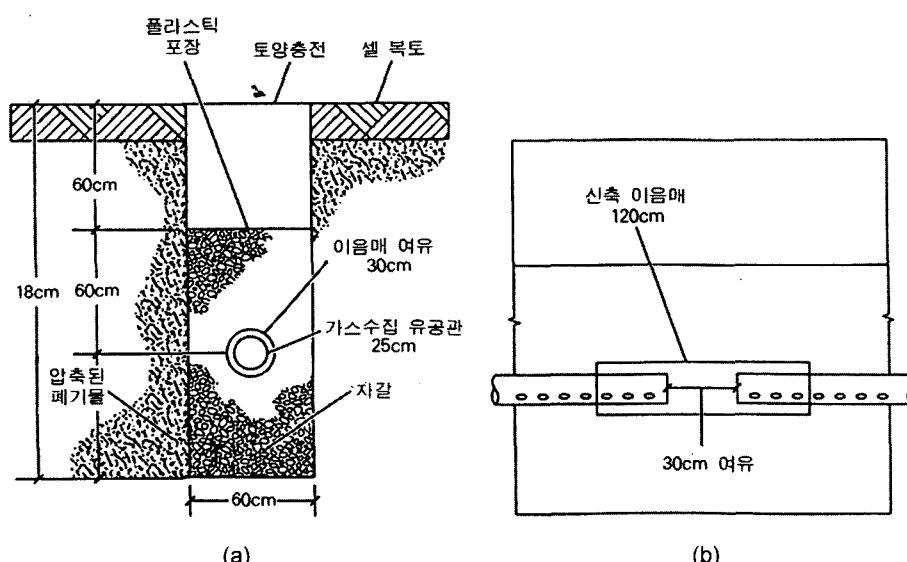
diagram of horizontal gas extraction trench: (a) cross section (b) side section.
